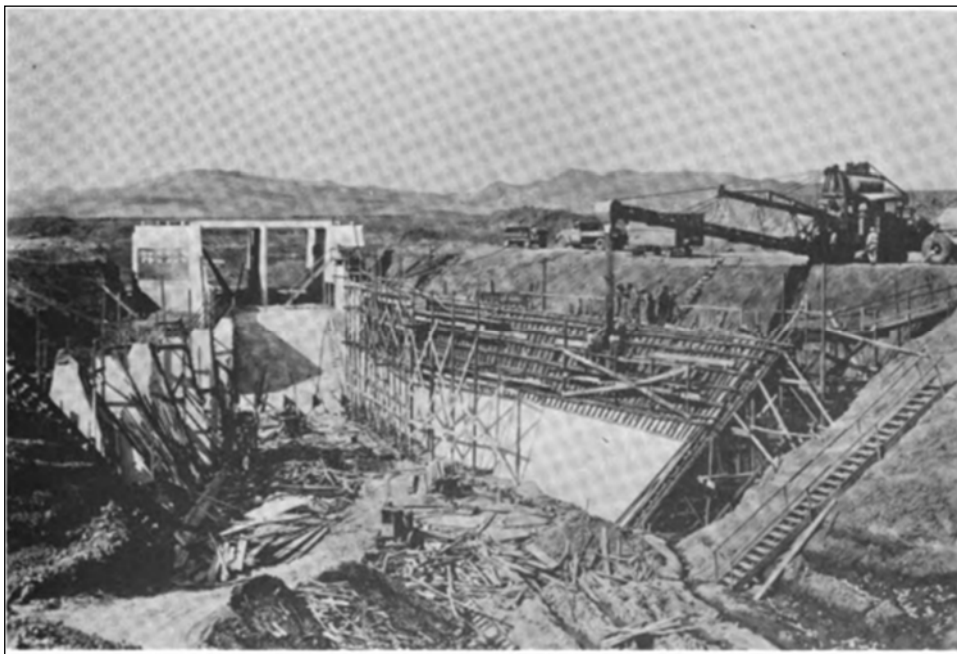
Placing concrete in transition walls of San Luis wasteway turnout, July 26, 1950.⁶⁸
